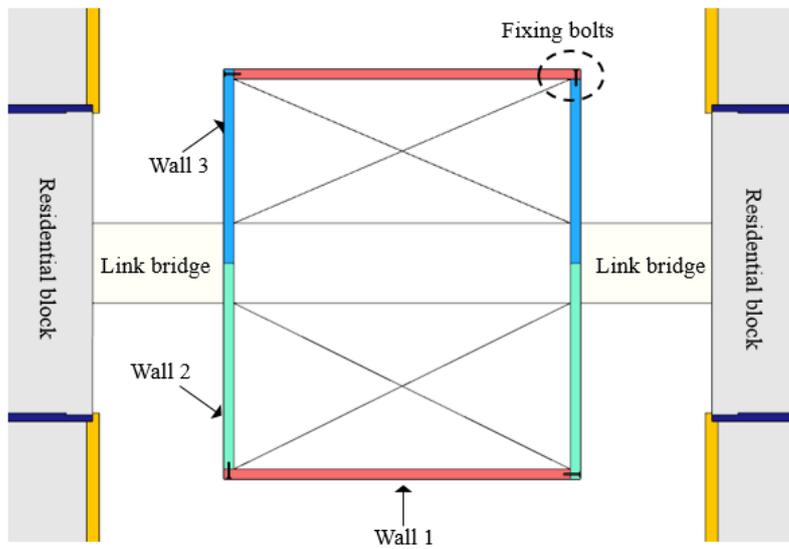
Lift/stair area comprised of three different wall panel types, which are bolted together at the corners
